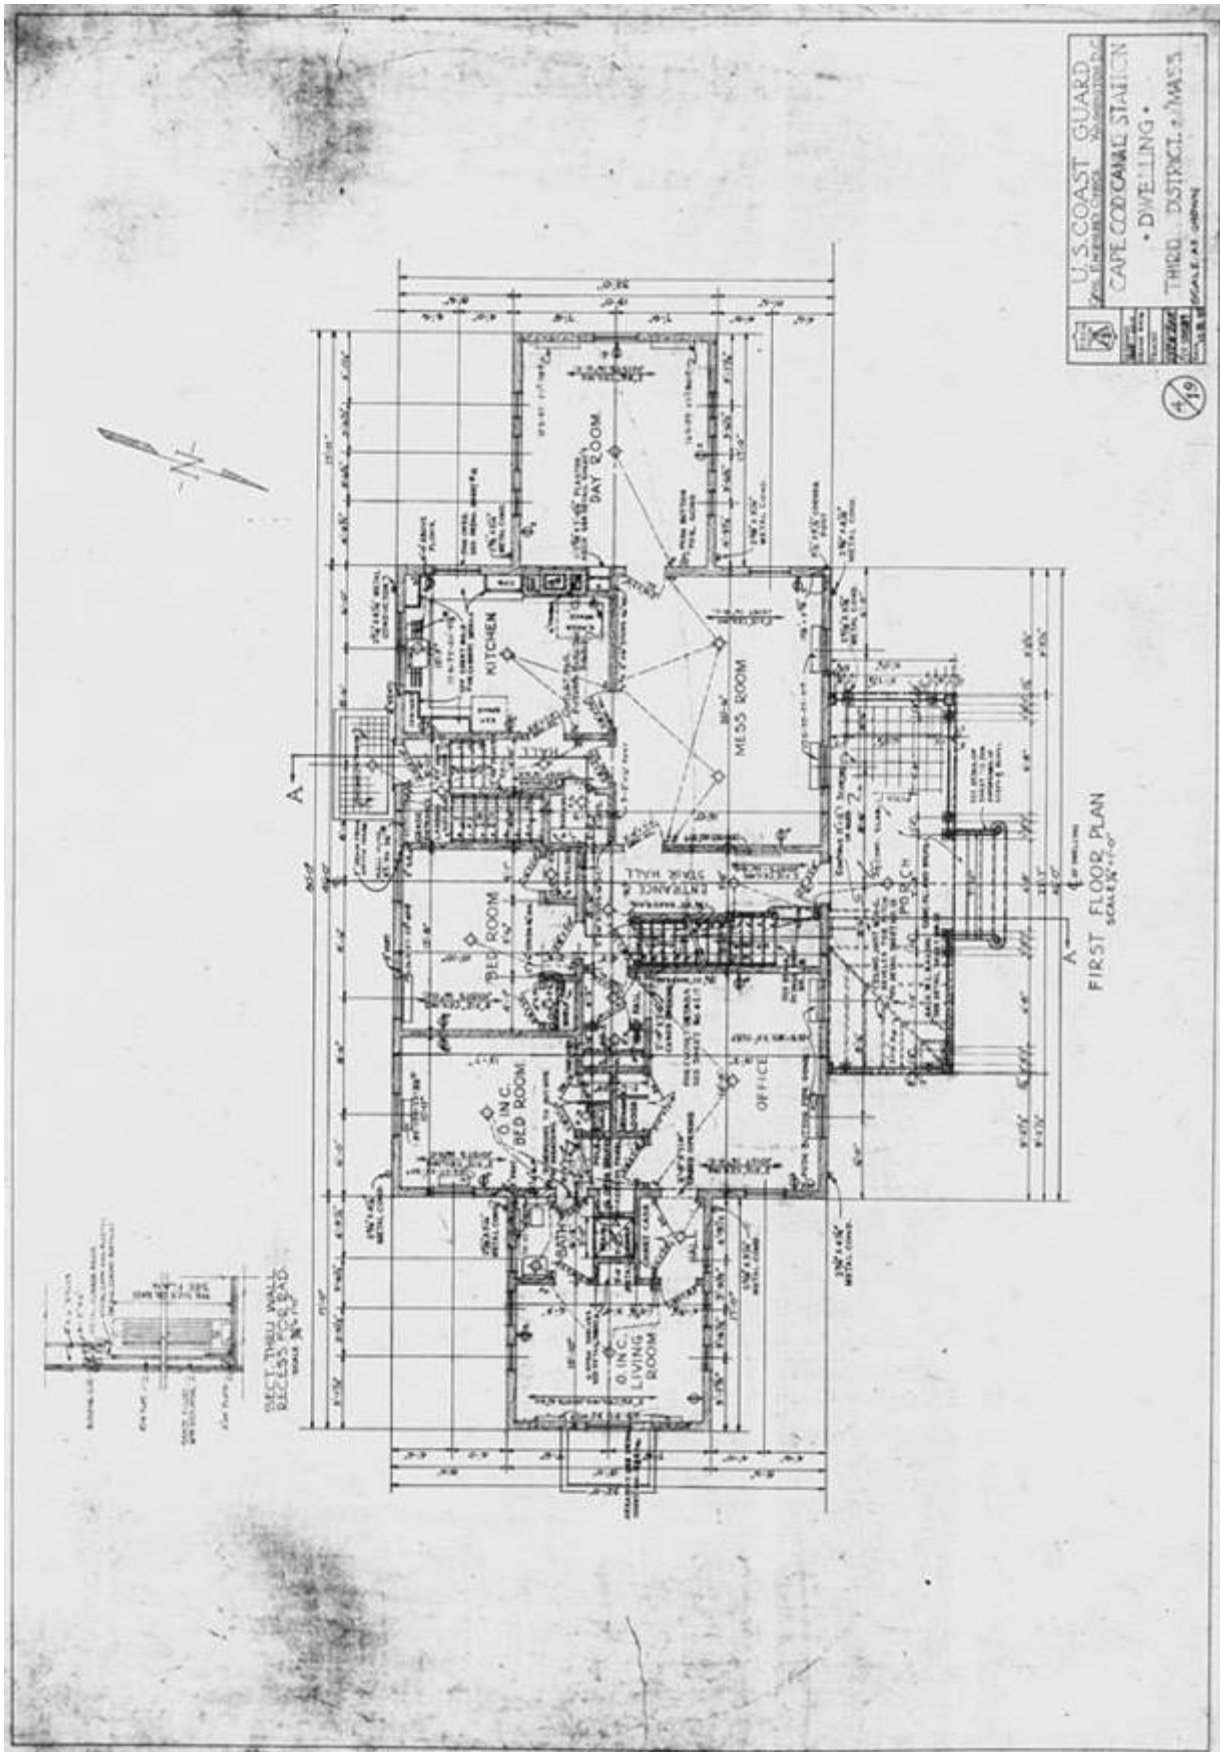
New Deal-era Coast Guard Station dwelling for Cape Cod Canal Station, first-floor plan, 1935.
